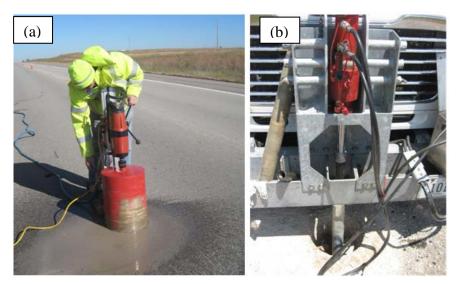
(a) Paving coring (b) collecting of undisturbed Shelby tube sample
